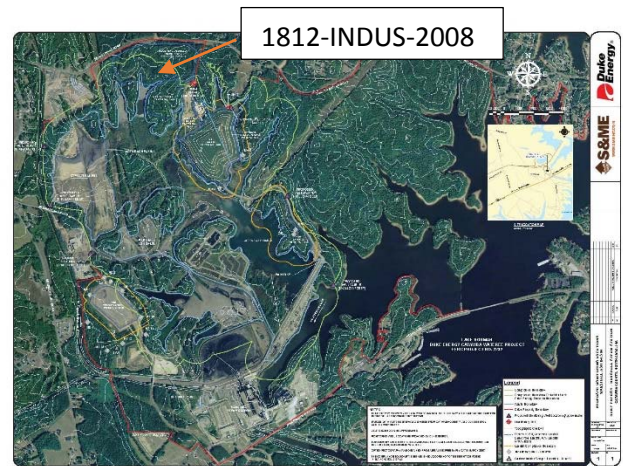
Permit 1812-INDUS-2008 SITE PLAN
